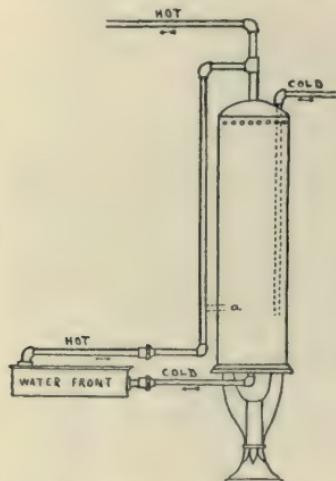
A good drawing for a chart to hang in the school shop. It shows how to connect pipes so as to draw hot water as soon as the fire starts.
